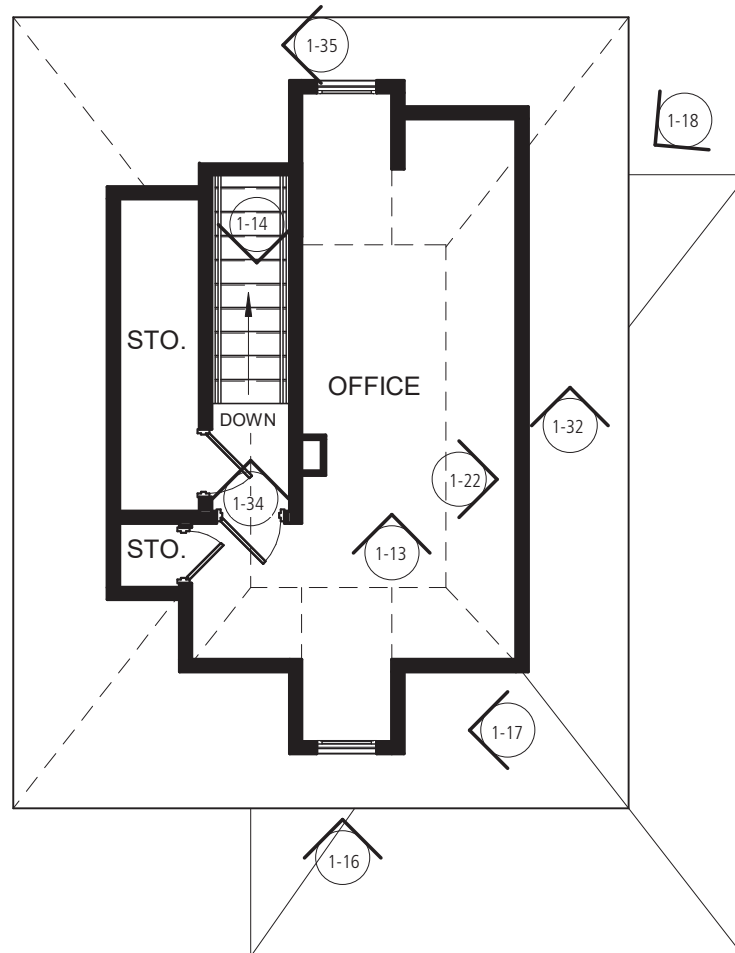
First Floor Plan, 2020 (source: Ratio)
